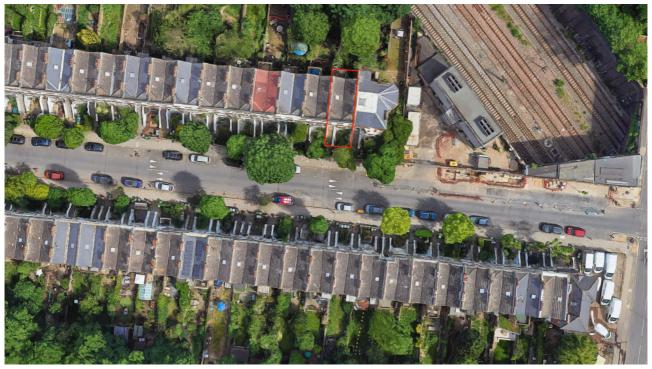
(above) showing a satellite view of street. The application site (106B Gaisford Street) is shown in context of neighbouring properties. It can be seen that the neighbouring property to the right has undergone development.
